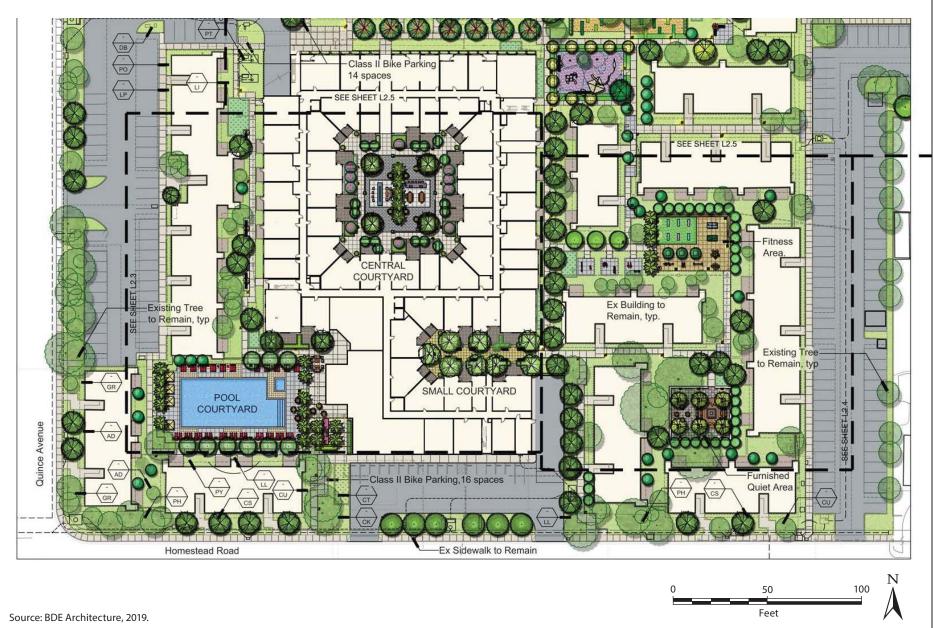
Proposed Landscape Plan (South) Laguna Clara II Project
